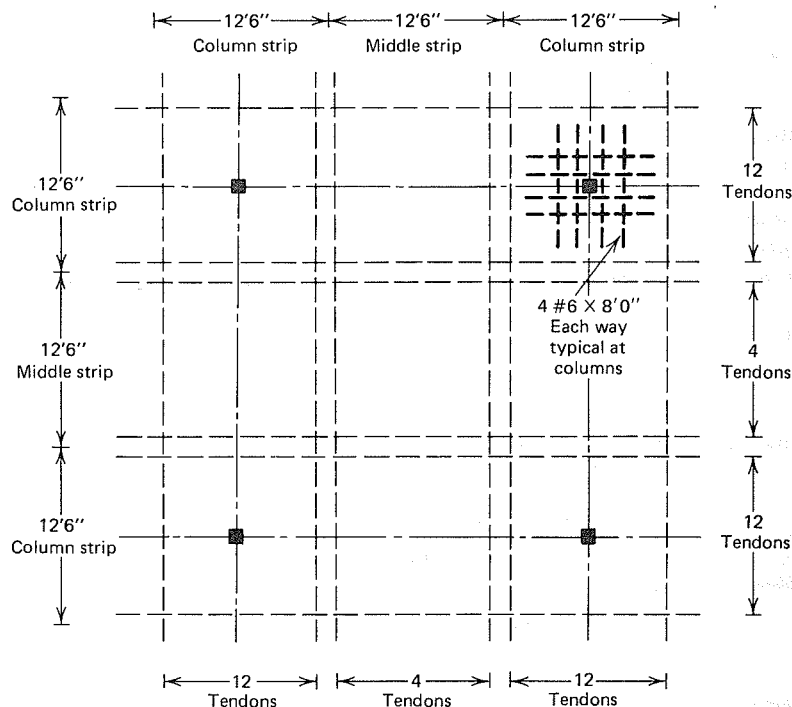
Reinforcing and prestress tendon layout for flat plate example.
